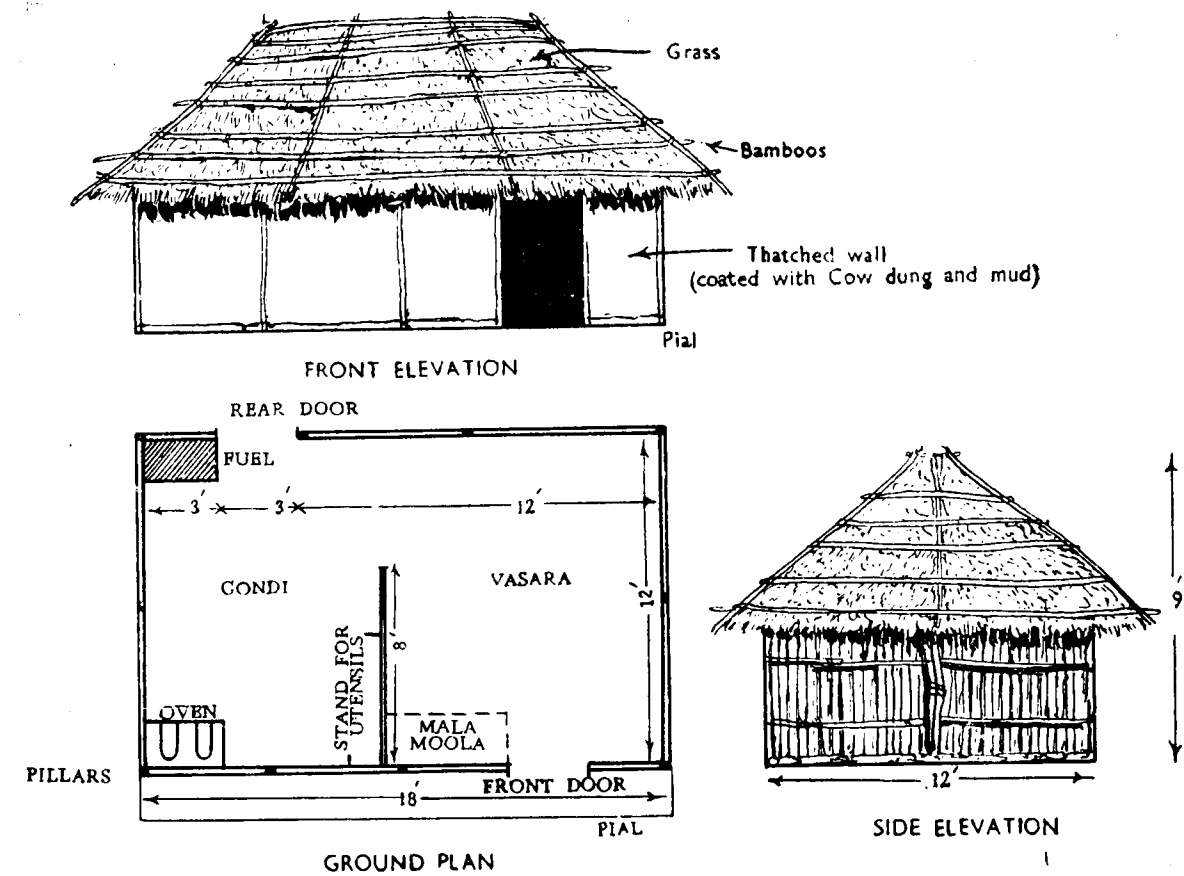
Ground plan, front and side elevation of a typical house (Chapter II—Para 42)
